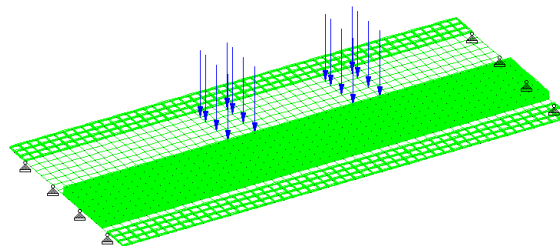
Bridge deck loading with the HB in blue, foot path and HA in green
